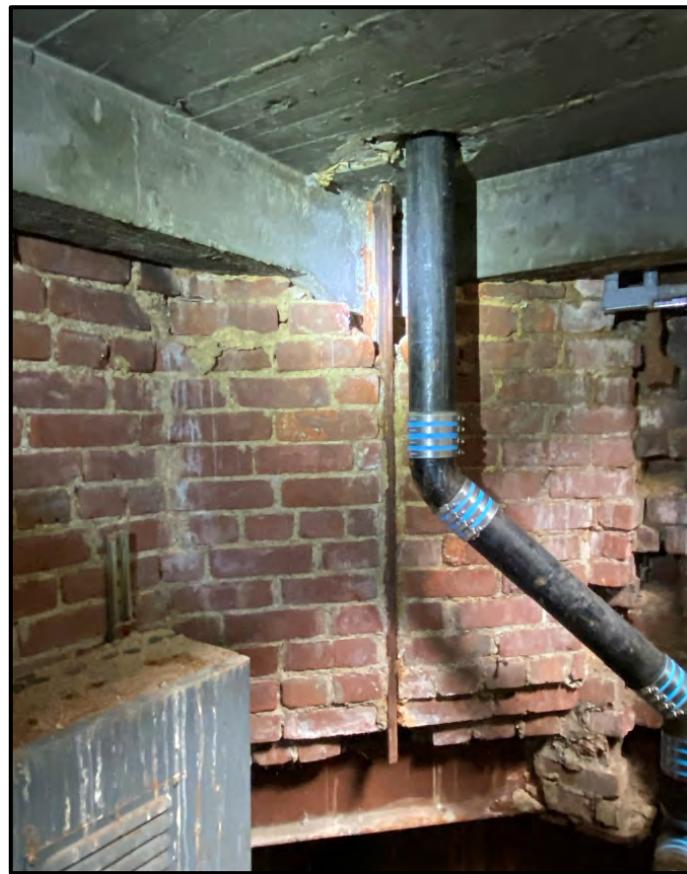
The concrete encased members supporting the level 1 concrete platform appear to be in good condition.
